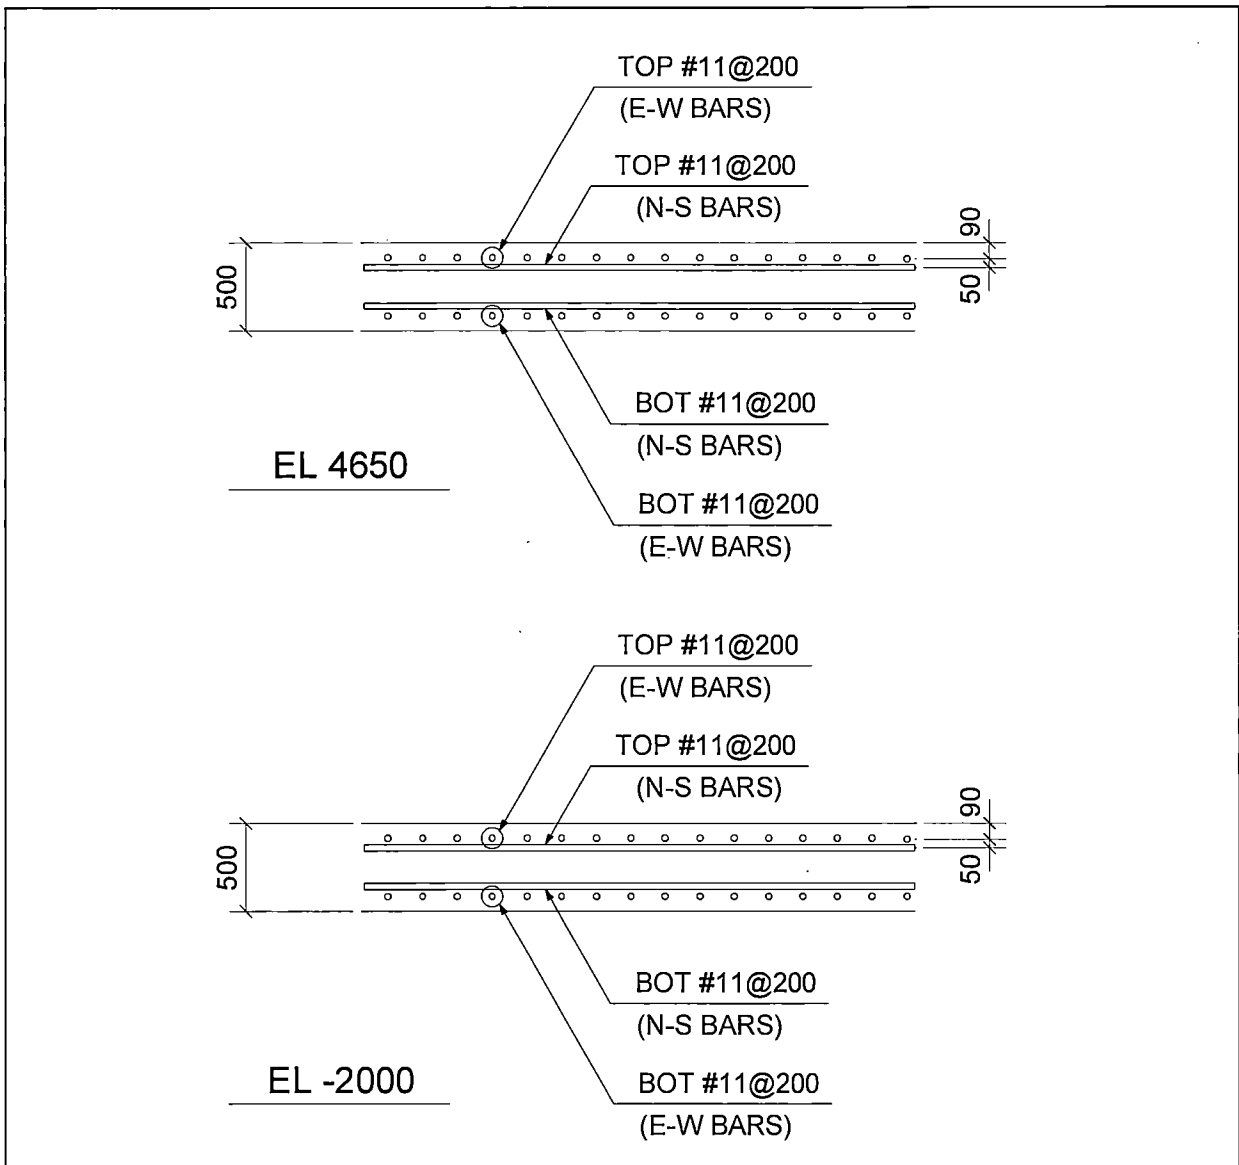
Assumed Floor Slabs Rebar Arrangement (unit: mm)
